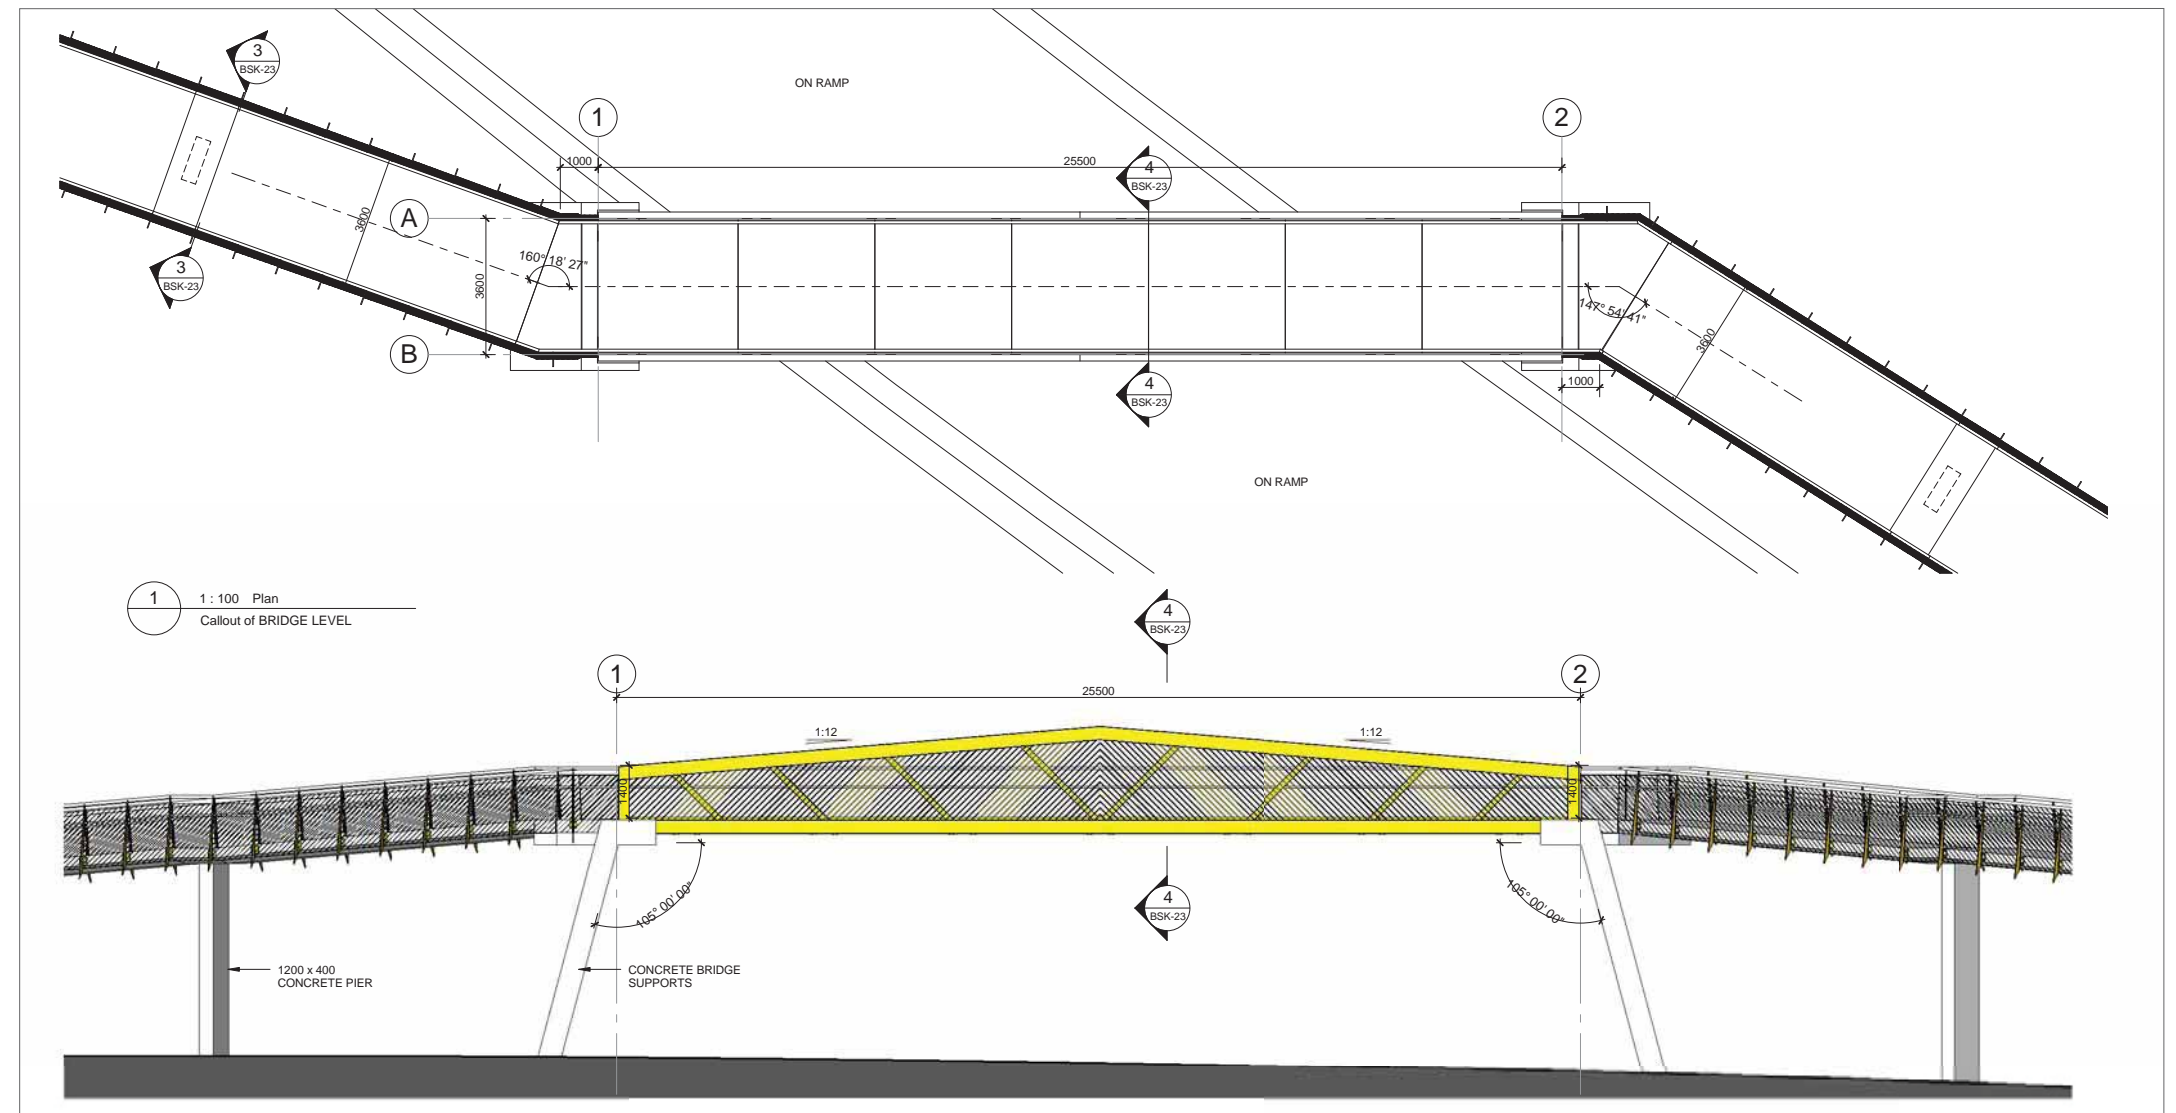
New cycleway bridge at Patiki Road. Note: minimum headroom clearance at ramps = 6.2m
